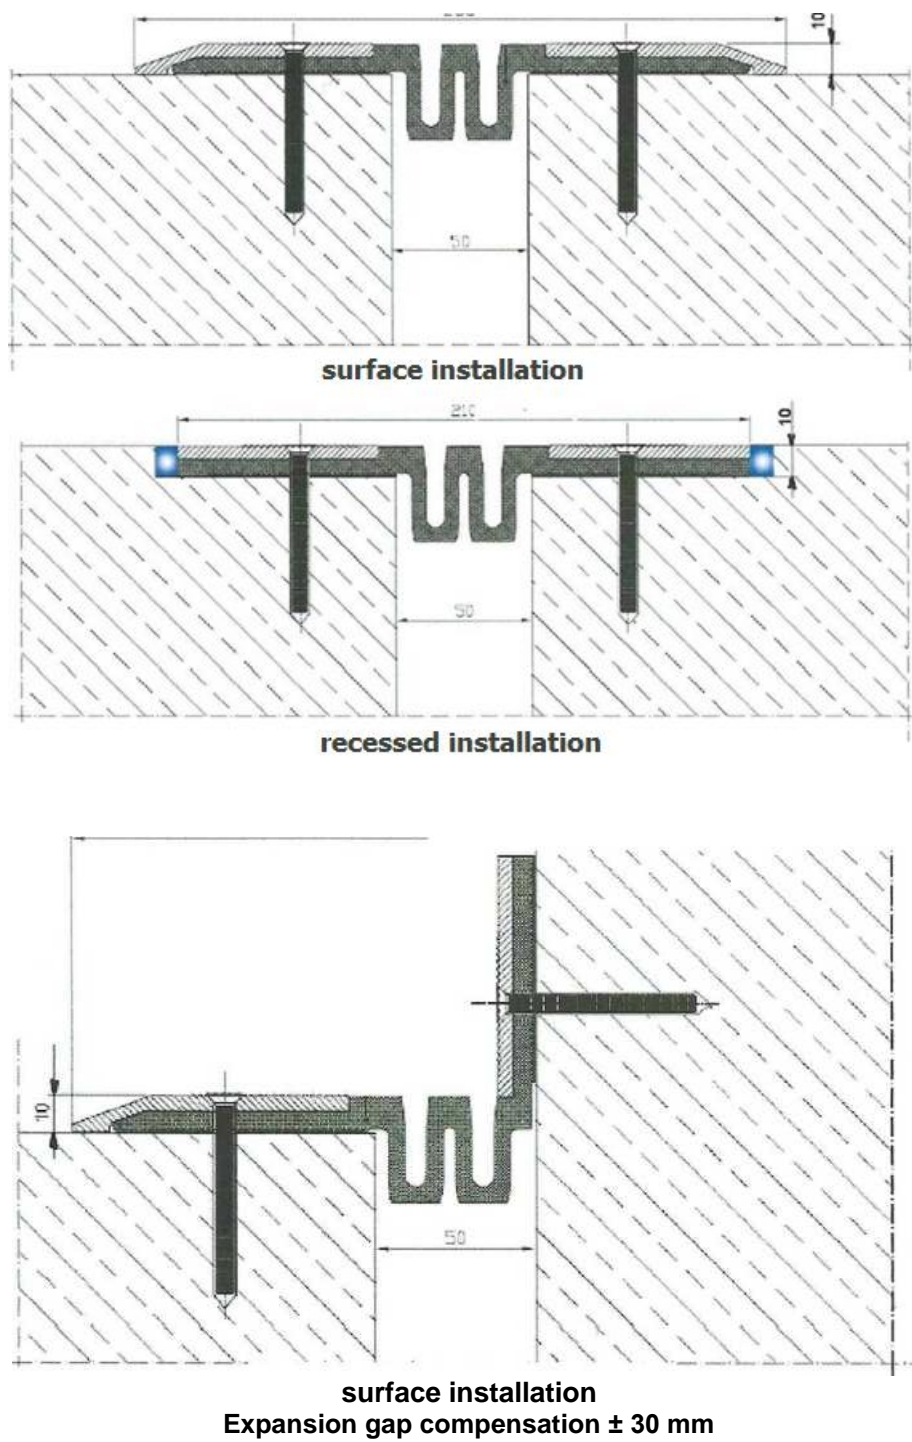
CONECTO PARK SL 210.50 waterproof expansion joint profile
